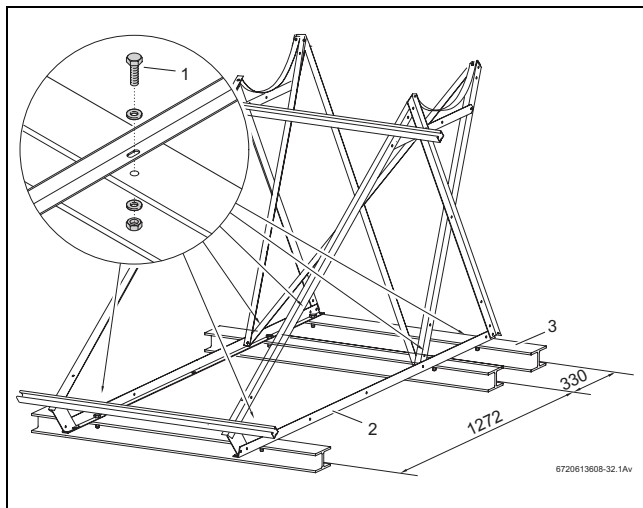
Roof connection for flat roof system on I-beams; dimensions in mm
